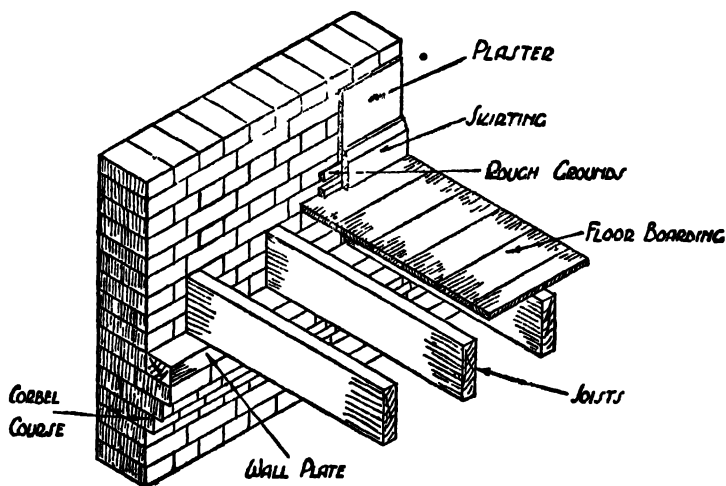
CONSTRUCTION AT UPPER FLOOR - CORBEL COURSE
